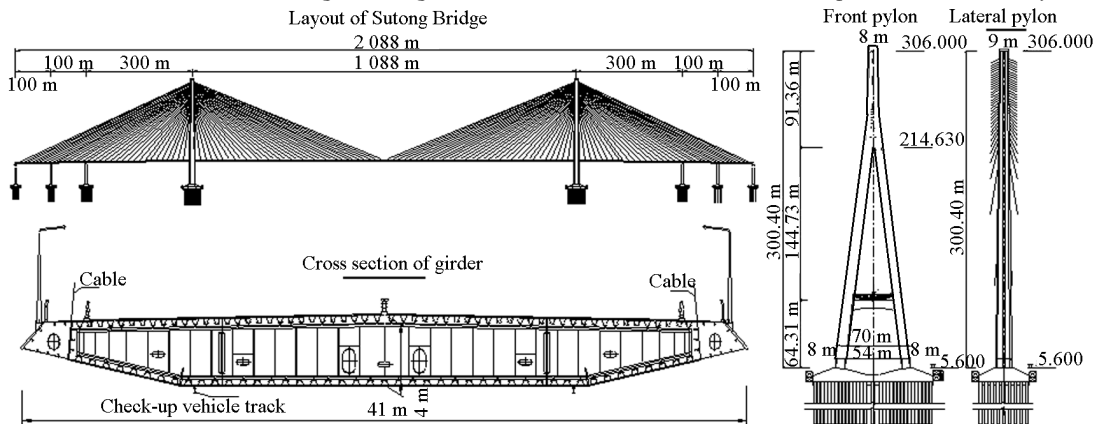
Plan, cross section of girder and pylon of Sutong Bridge
